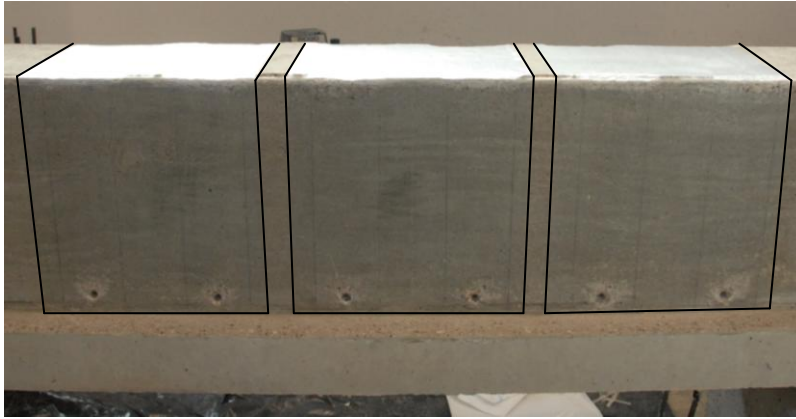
Clear plastic liner used to prevent bond between CFRP laminates and surface of the concrete specimen
